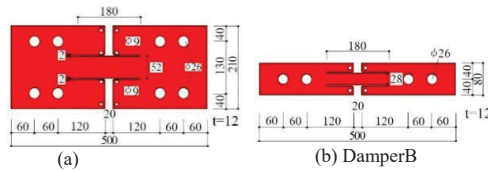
Steel damper for 2nd experiment(Unit:mm)
